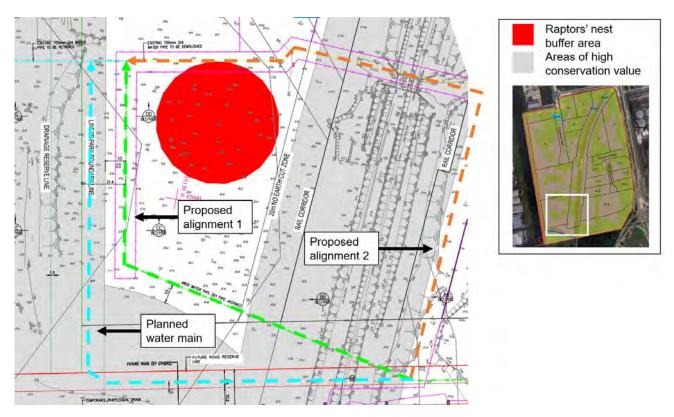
Existing plan and proposed diversion of water main (Source: CPG)
